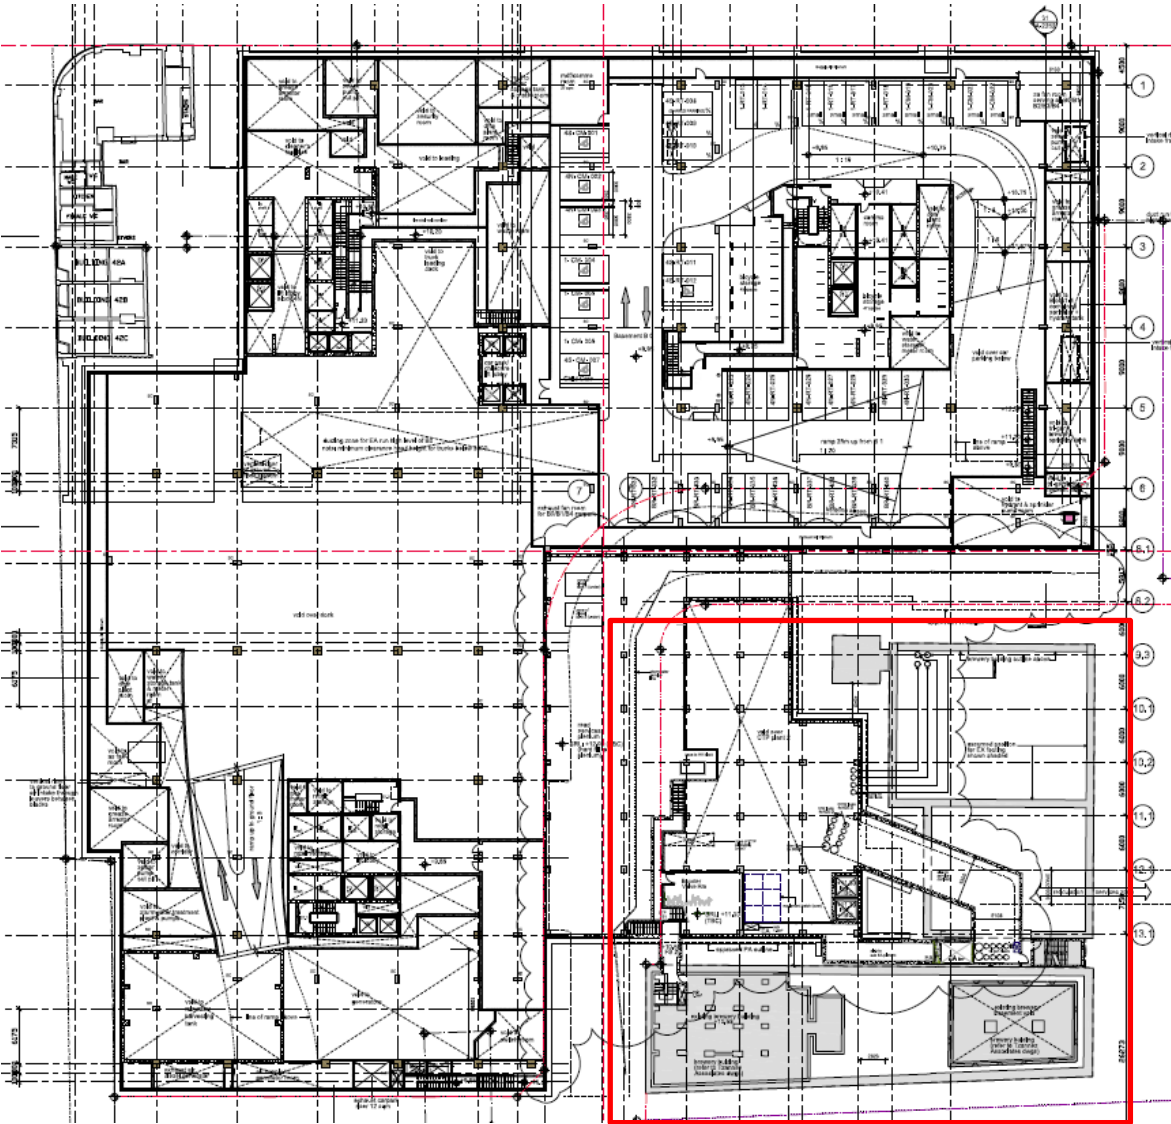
Part site plan showing the basement and trigon plant in blocks 1 and 4 North. The subject brewery building and yard are indicated at the bottom right of the image
